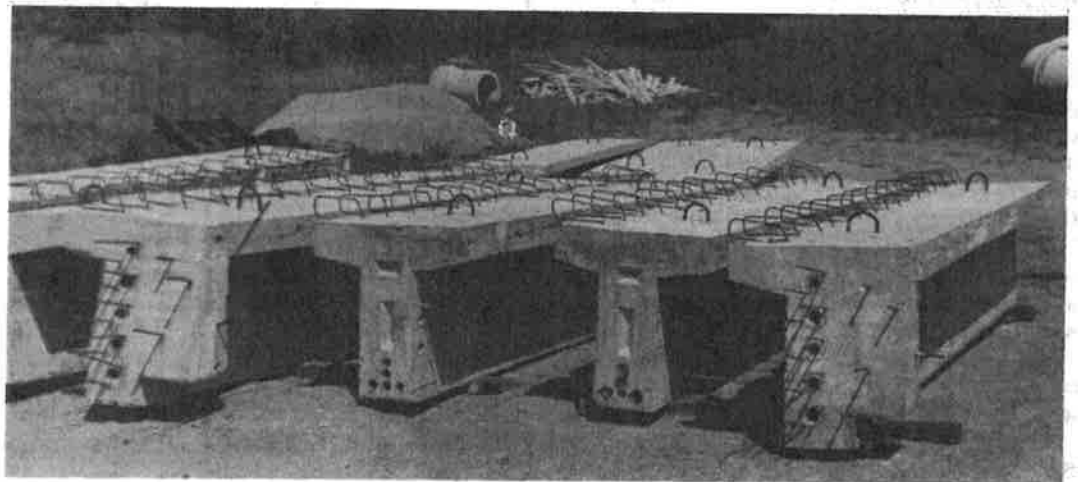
Precast beams for Bridge No.7, Pike, New York.
